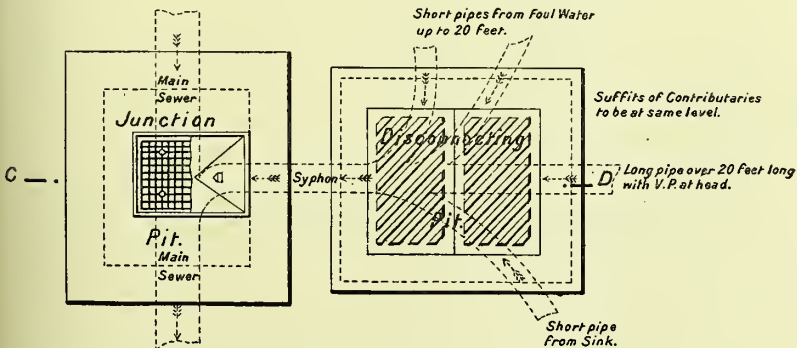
Plan of Disconnecting Pit for a Series of Pipes.
